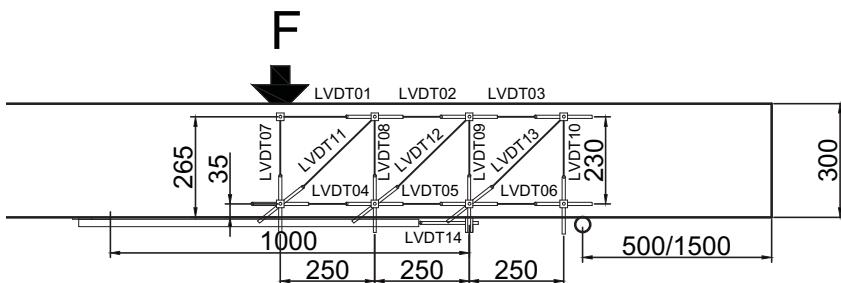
LVDT layout and numbering for 300 mm deep beams
